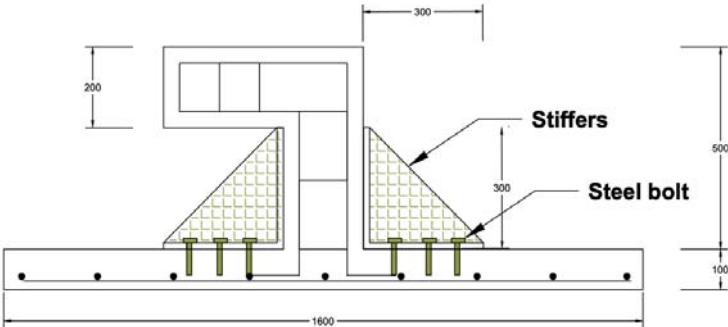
Specimens geometry and reinforcement details (all dimensions in mm)
